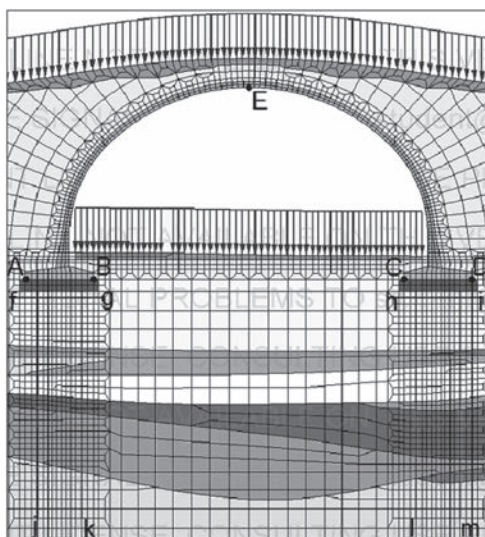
Scheme of FEM mesh of the tunnel foundation on jet-grouting columns
